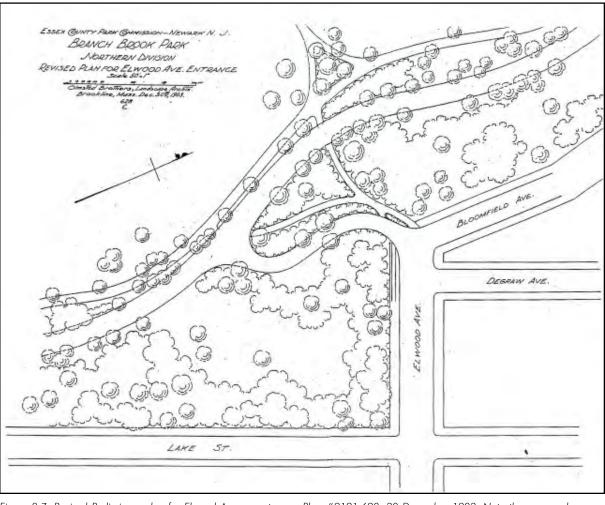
Revised Preliminary plan for Elwood Avenue entrance, Plan #2121-628, 30 December 1903. Note the proposed heavy planting to screen the entrance. Source: ONHS.
